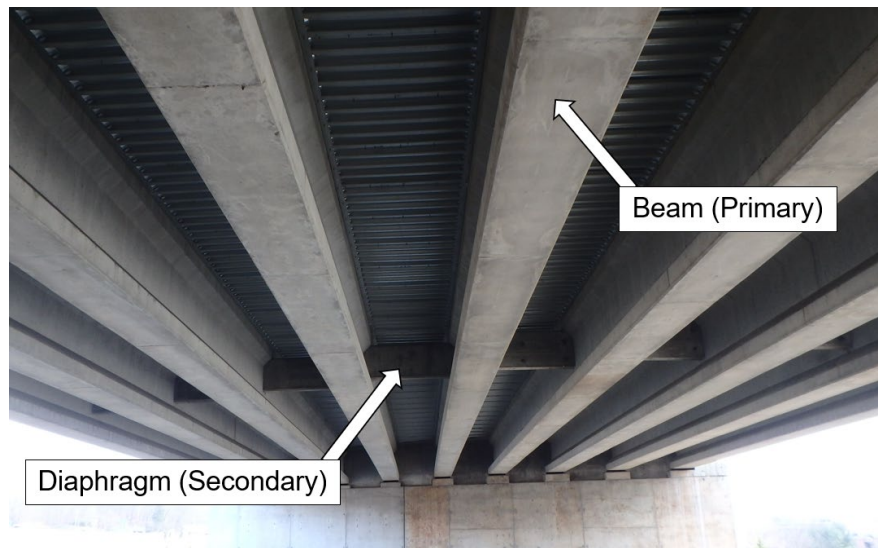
Intermediate Diaphragms on an I-Beam Bridge
